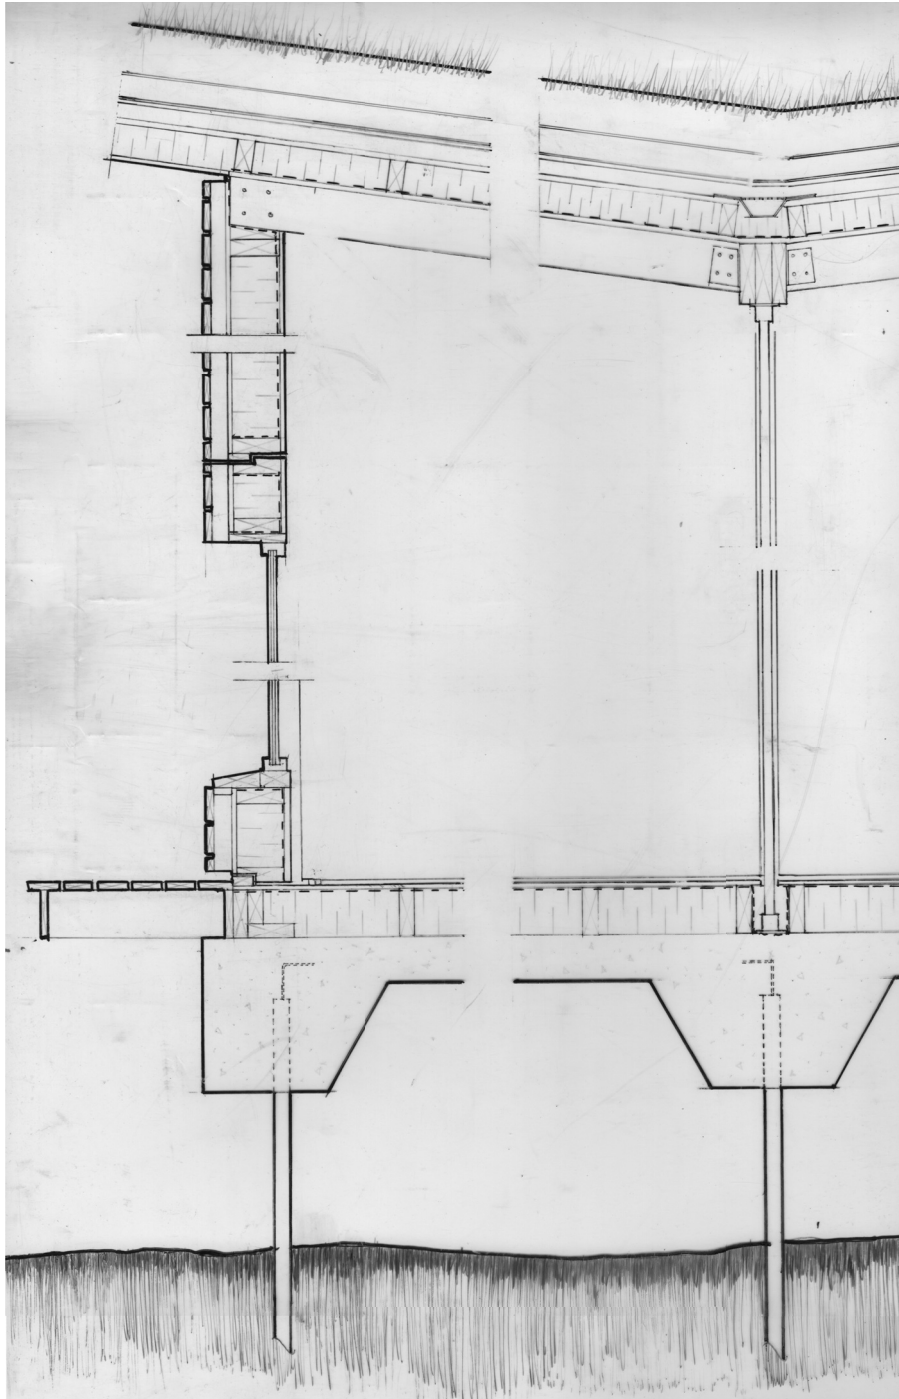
Wall section two: interior moveable wall to exterior facade
